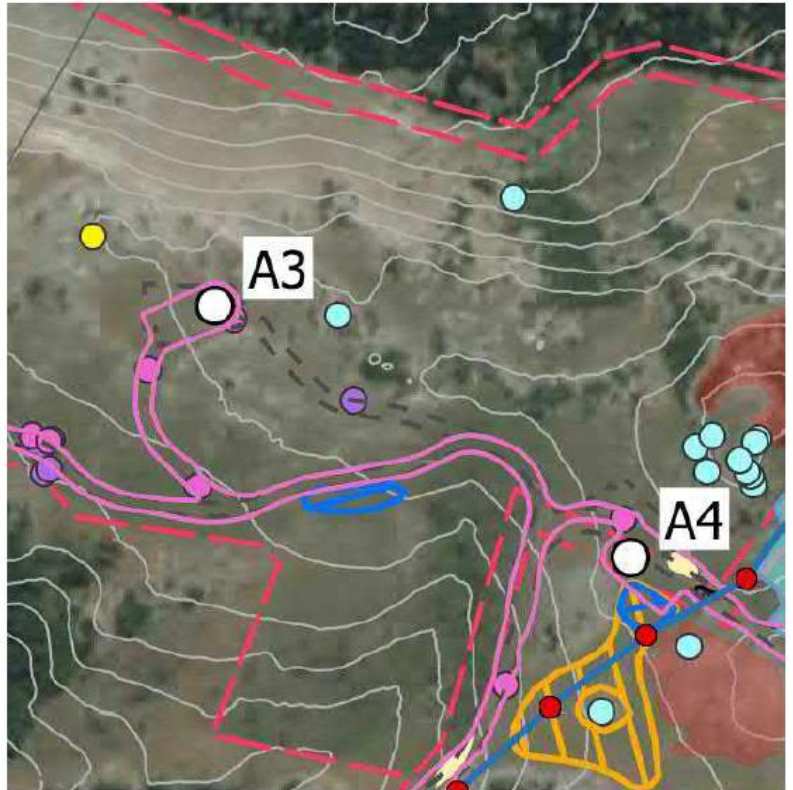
Consented access road alignment (grey) compared to the proposed access road alignment (pink)
